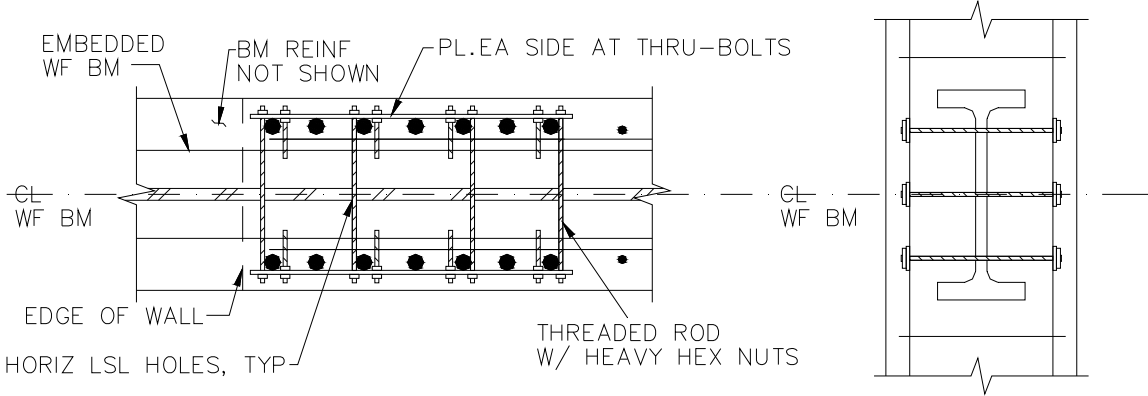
Threaded Rods and Side Plates at Embedded Steel Section
